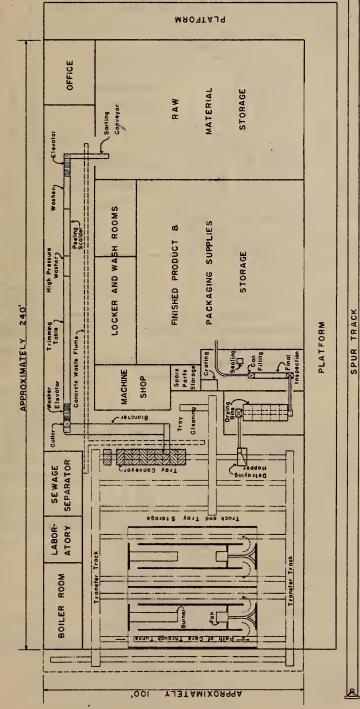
LAYOUT OF 50-TON DEHYDRATION PLANT
